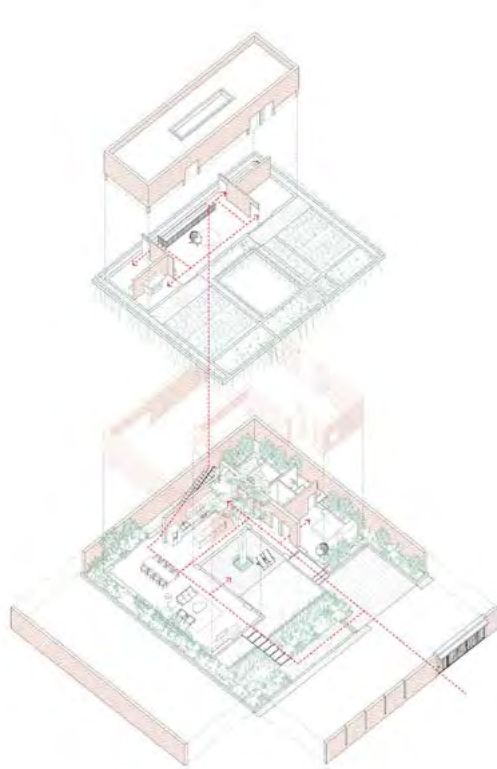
[ABOVE] Exploded Axonometric drawing for the Curtain House <https://www.archdaily.com/948380/greenery-curtain-house-hgaa>
